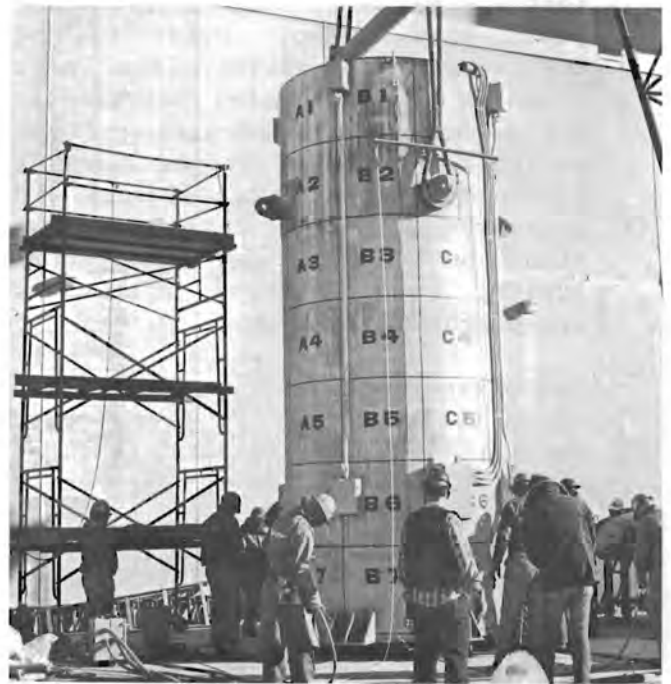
Concrete Silo With Canister Assembly Being Lowered Onto Storage Pad
